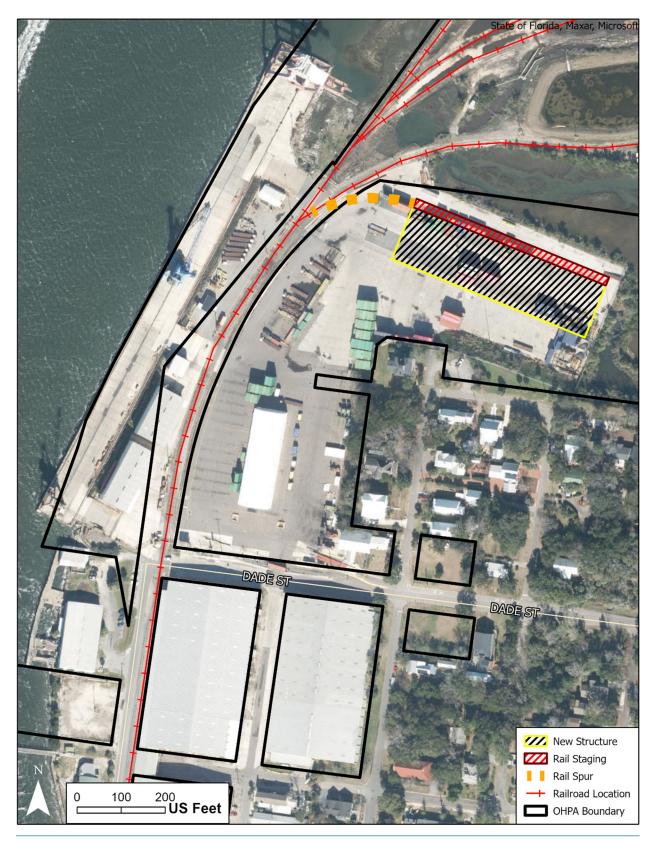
POTENTIAL LOCATION OF RAIL SPUR AND COVERED STORAGE IMPROVEMENT
